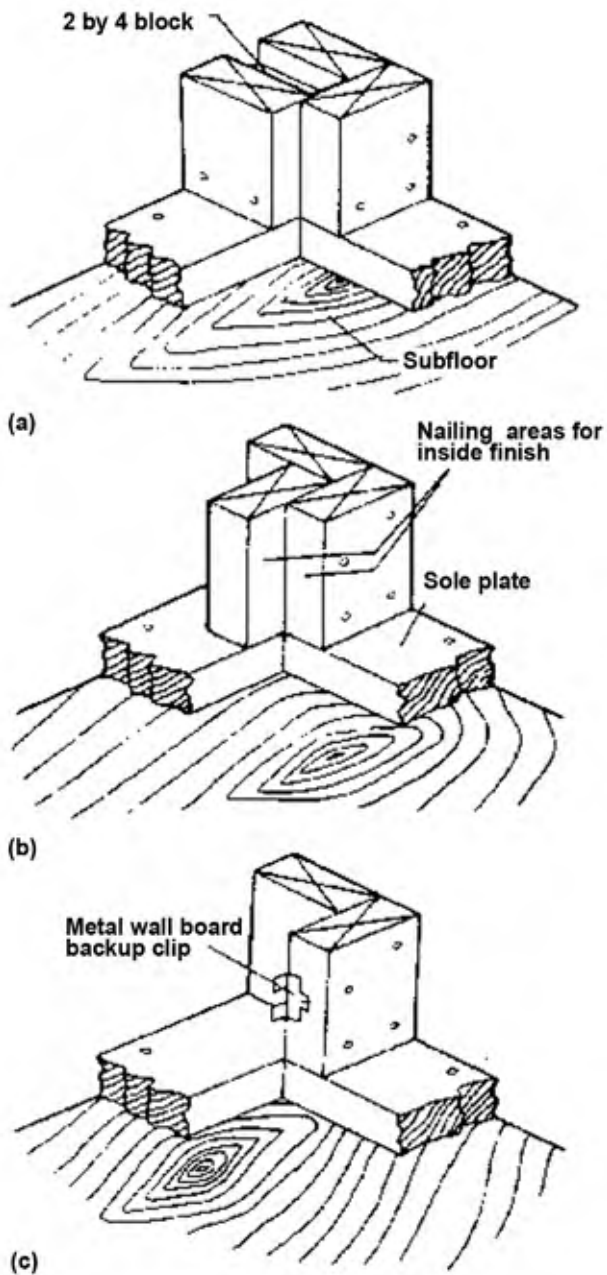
Corner details for wood stud walls that provide support for interior sheathing: (a) traditional three-stud corner with blocking; (b) three-stud corner without blocking; (c) two-stud corner with wallboard backup clips.
